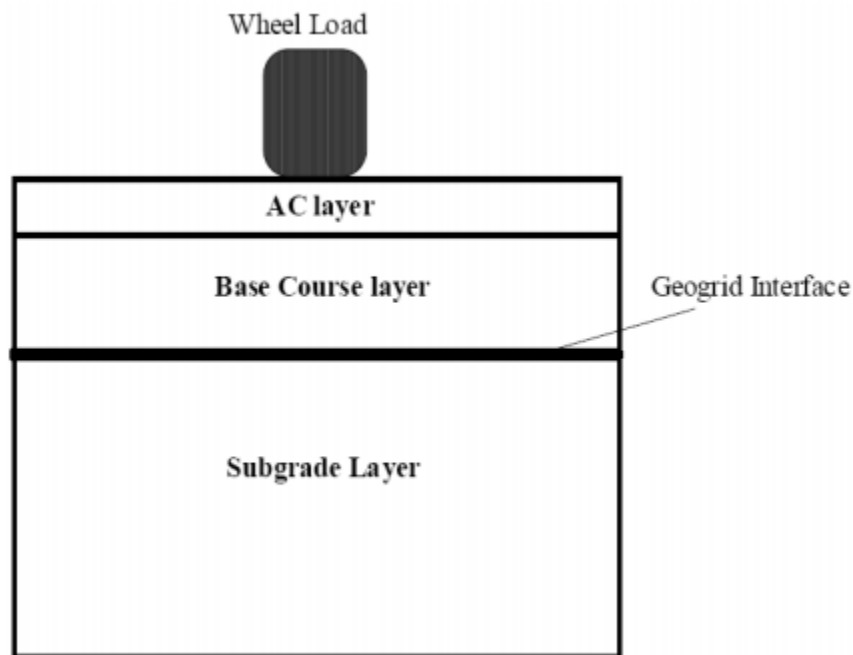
2: Section layout of geogrid reinforced bases in flexible pavements(Anderson and Killeavy 1989, Barksdale et al, 1989 and Cancelli et al., 1996)
